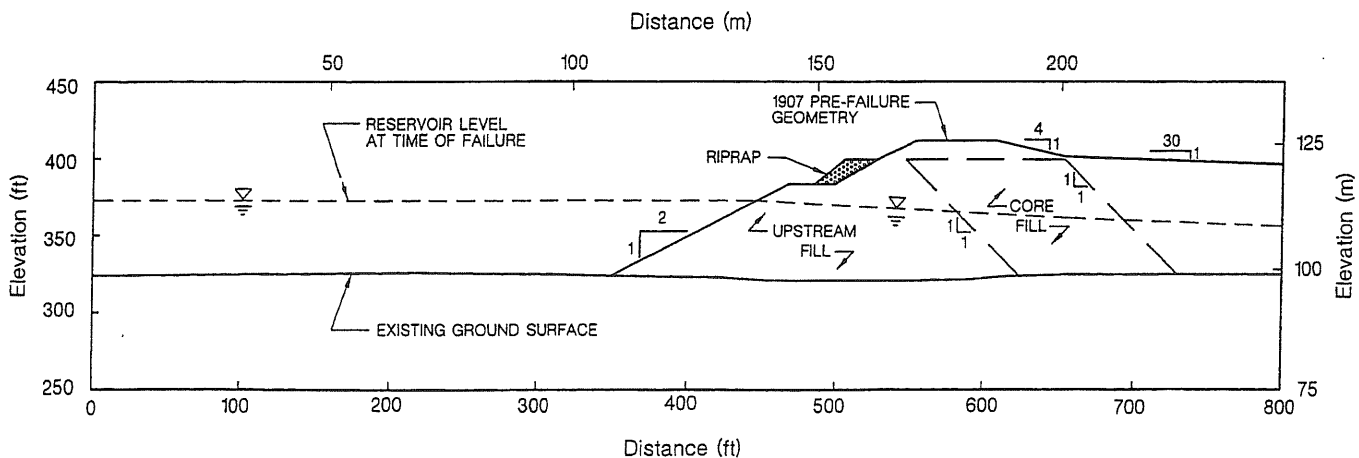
Prefailure Cross Section of the North Dike of Wachusett Dam at Station 23+20
